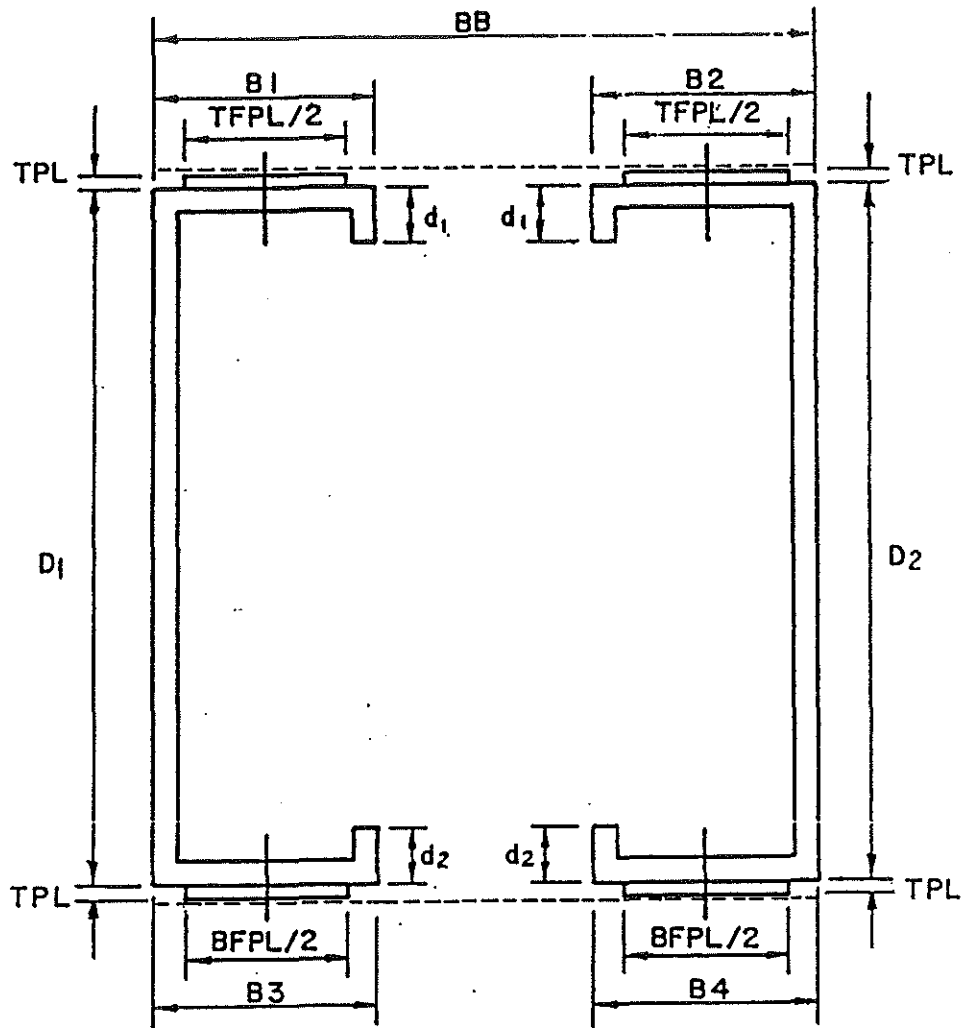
Dimensions of Shear Test Specimens with Shear Stiffeners
